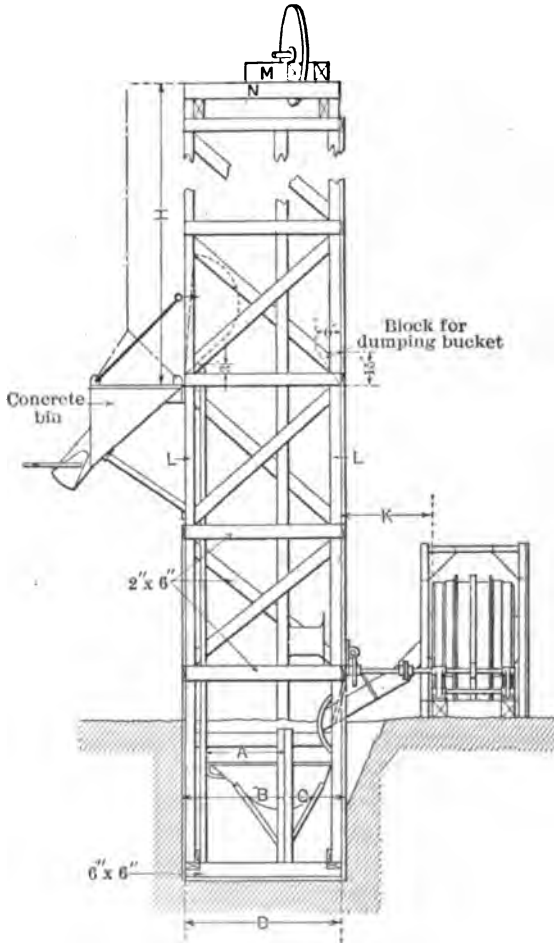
SIMPLEST PLANT FOR SPOUTING CONCRETE.
